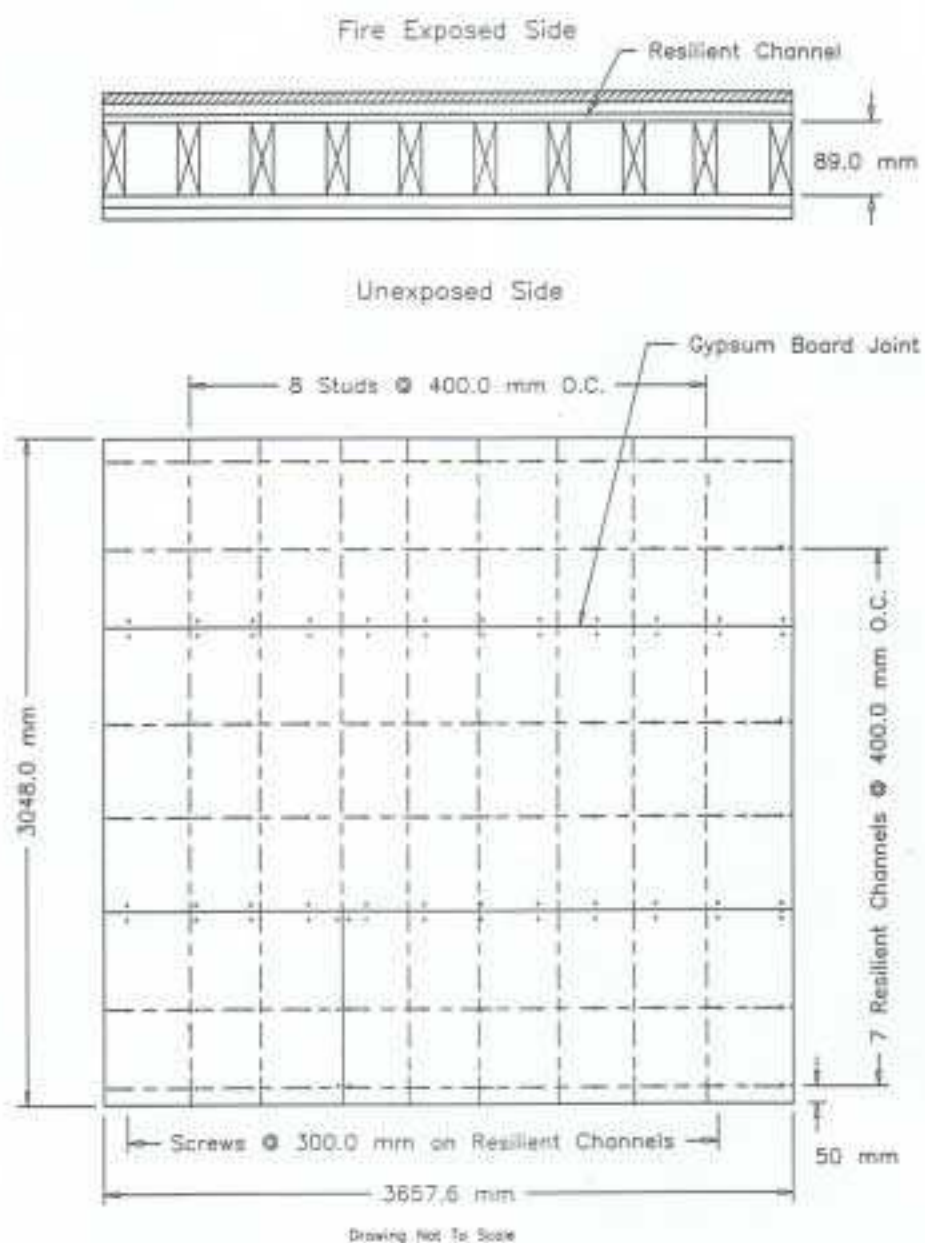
Screw Locations For Wood Stud, 2x2 Gypsum Board Layers, Full-Scale Assembly, Resilient Channel on Exposed Side (Face Layer Exposed Side)
